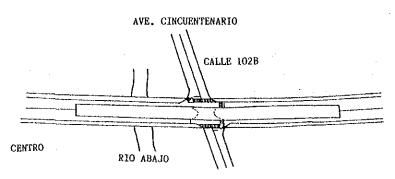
SKETCH OF RIO ABAJO INTERSECTION
